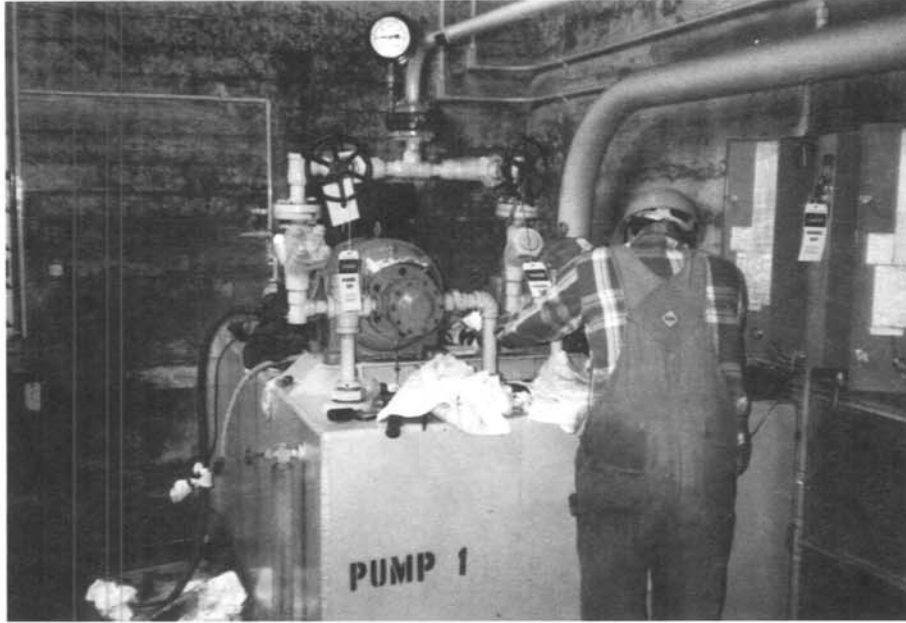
Unit 4—Butterfly valve hydraulic oil pumps and sump. Motors had to be removed for cleanup and drying. 1/18/91
